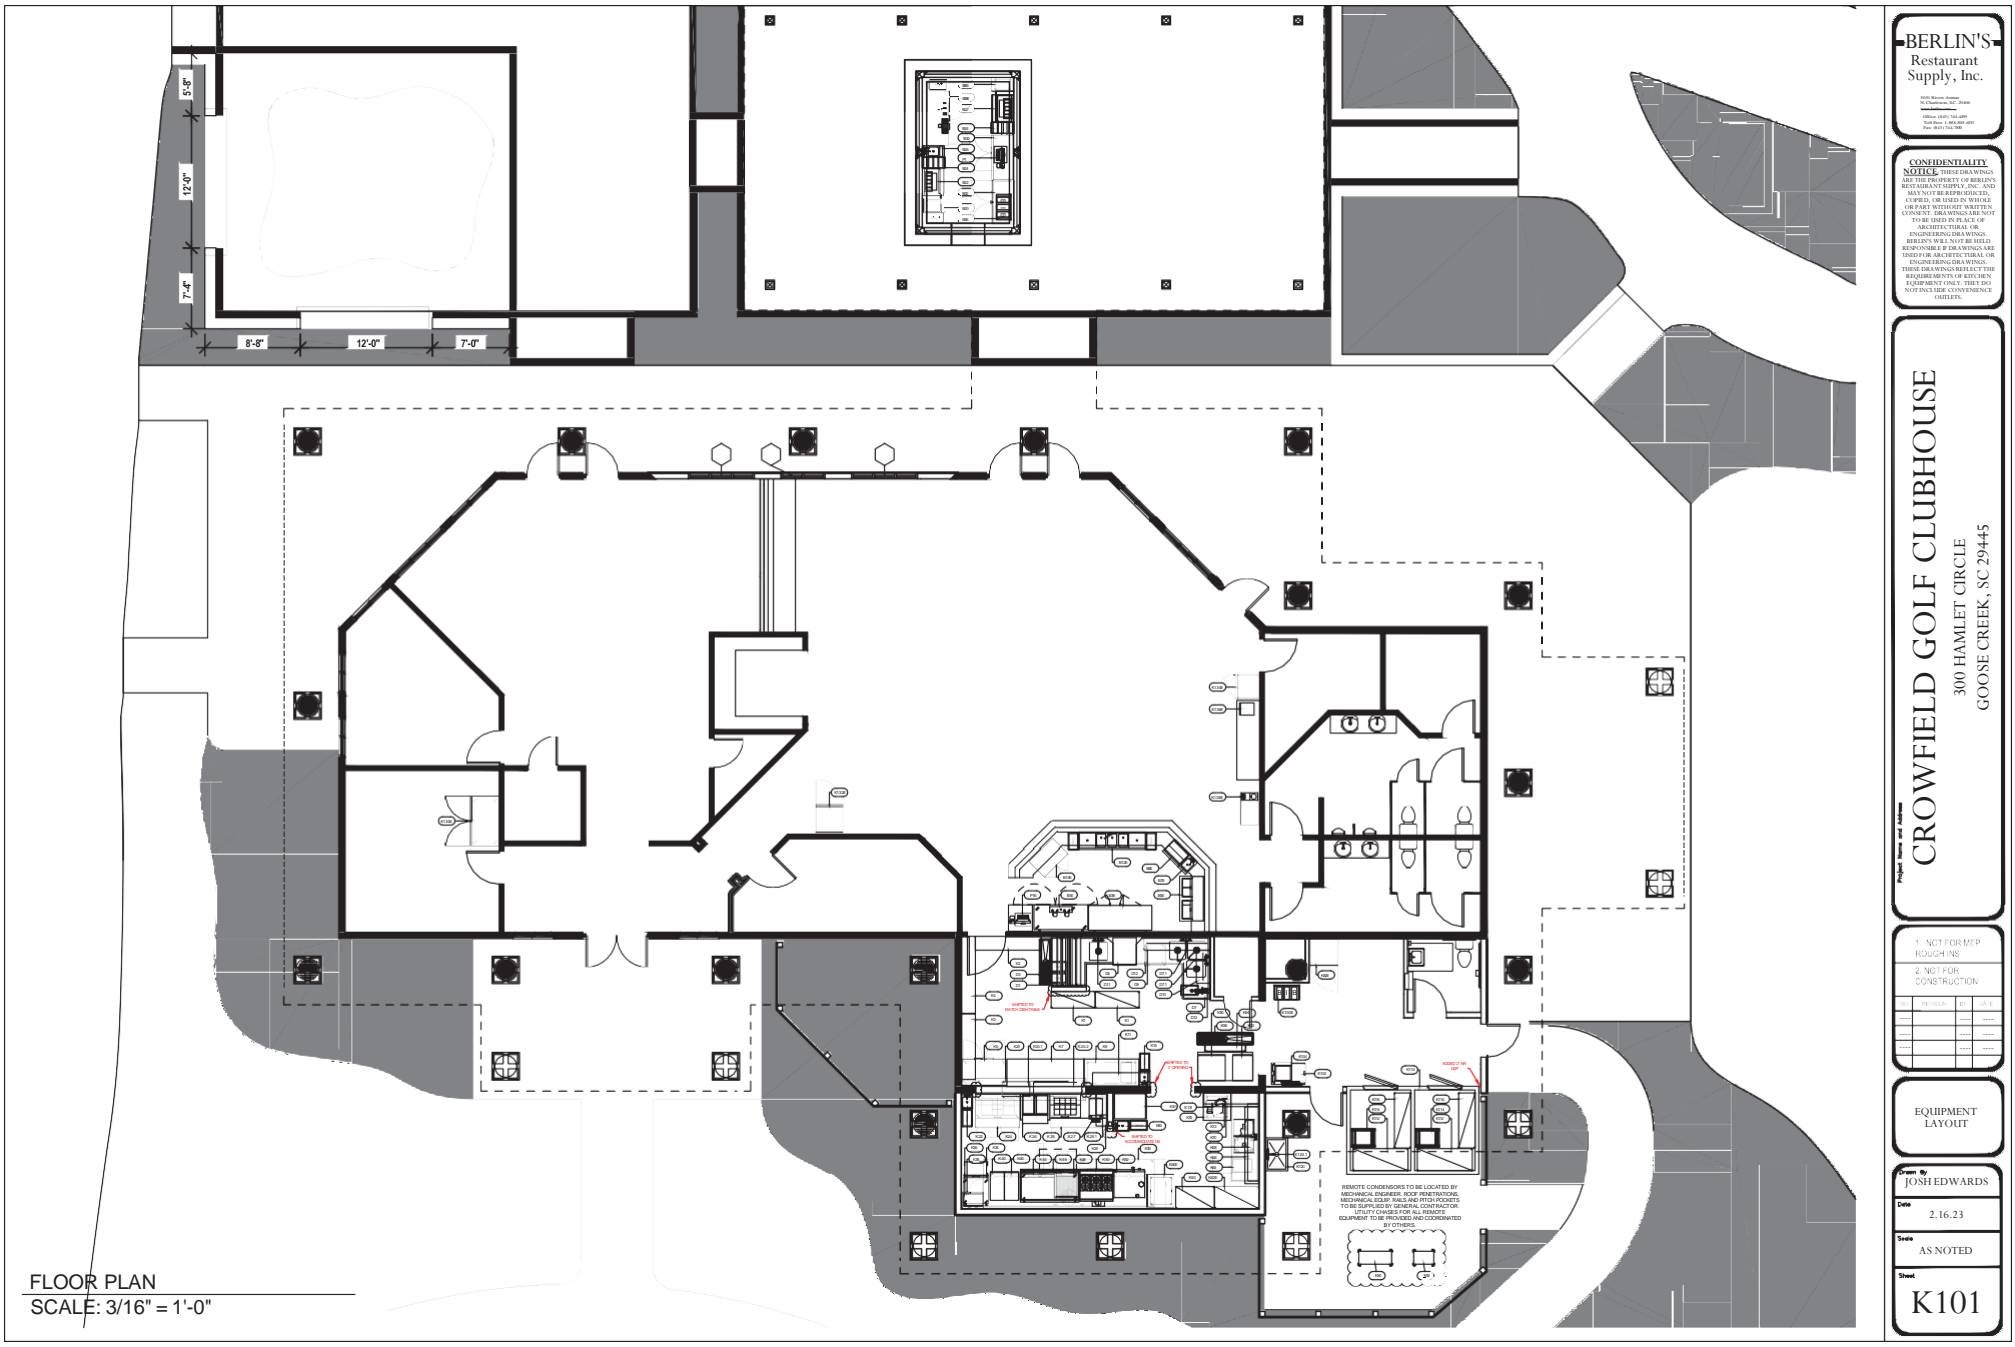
EXHIBIT B - KITCHEN LAYOUT & EQUIPMENT SPECIFICATIONS
